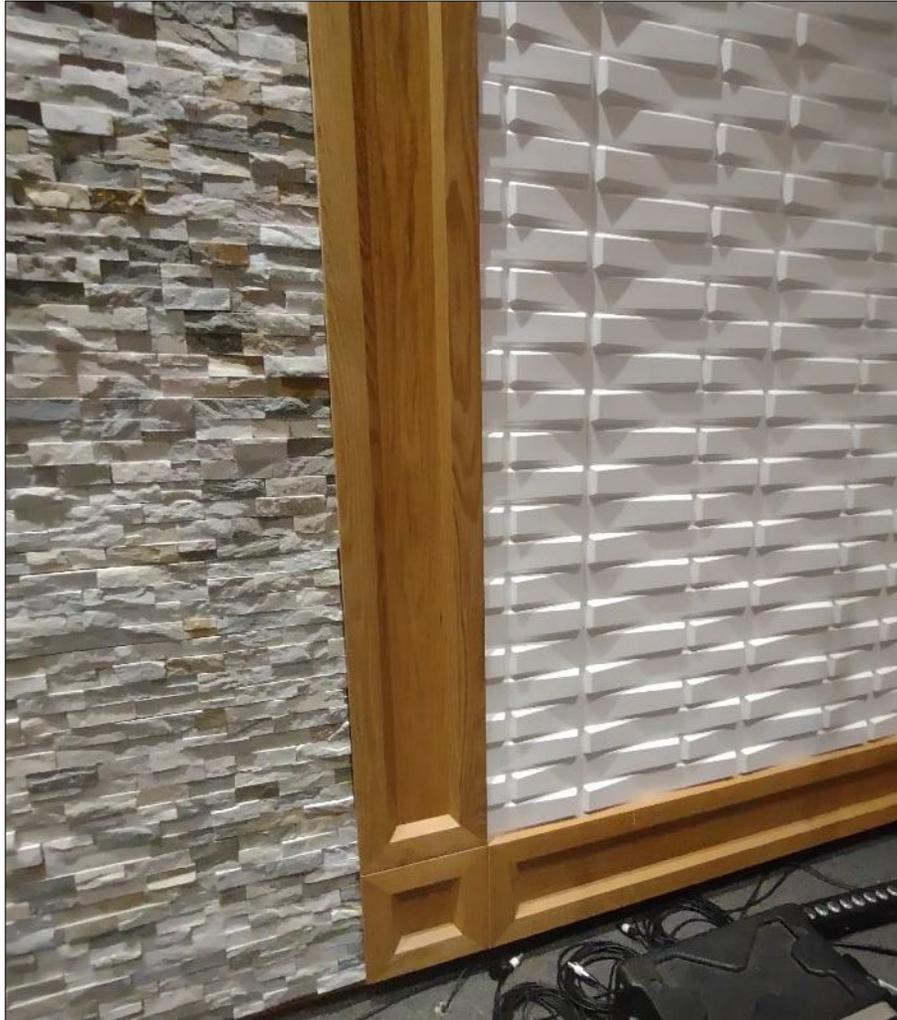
Closeup of wood trim, stacked stone, and plastic, faux basketweave panels.
